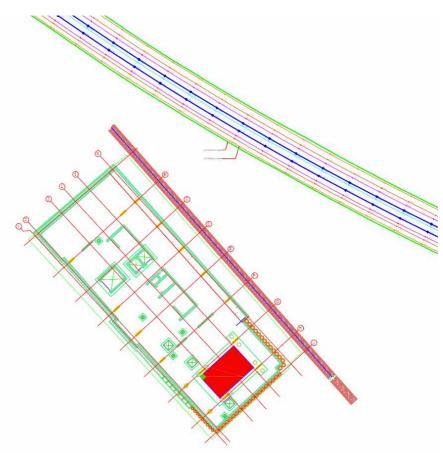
Crossrail Asset overview layout plan relative to proposed development
